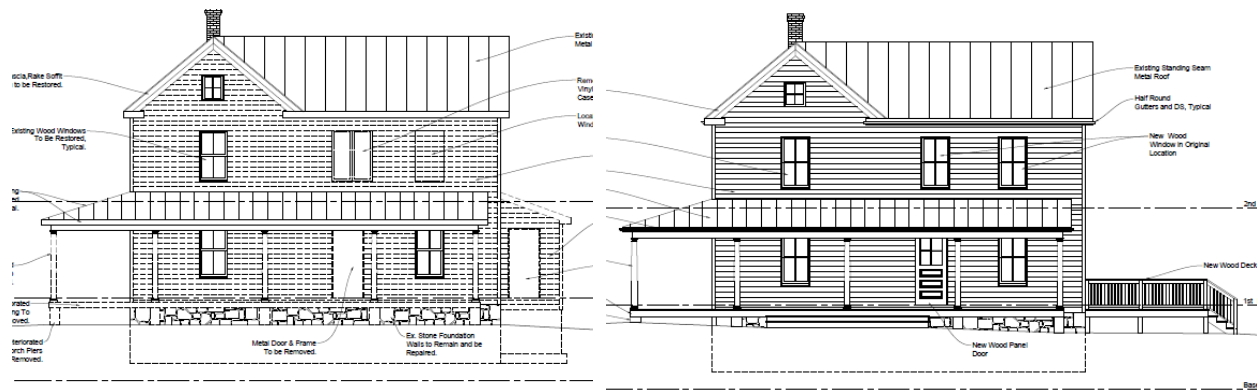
Existing conditions/demolition west side elevation drawing (left) and proposed west side elevation (right).
